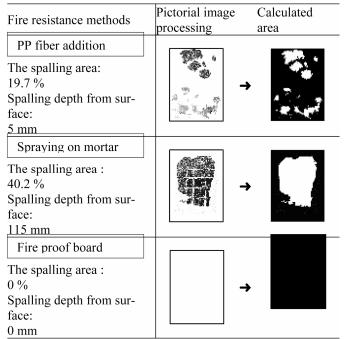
Evaluation of spalling area based on binary image processing according to RABT.
